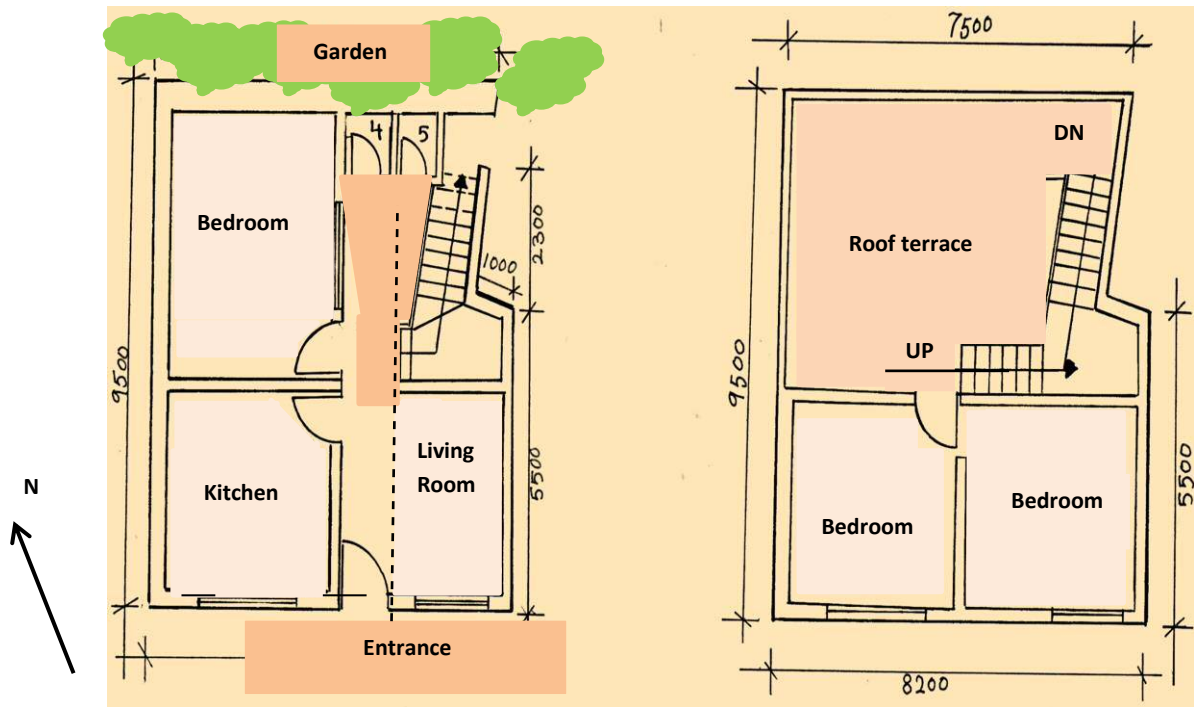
Ground floor level and first floor level plans of modern house No. 4.
